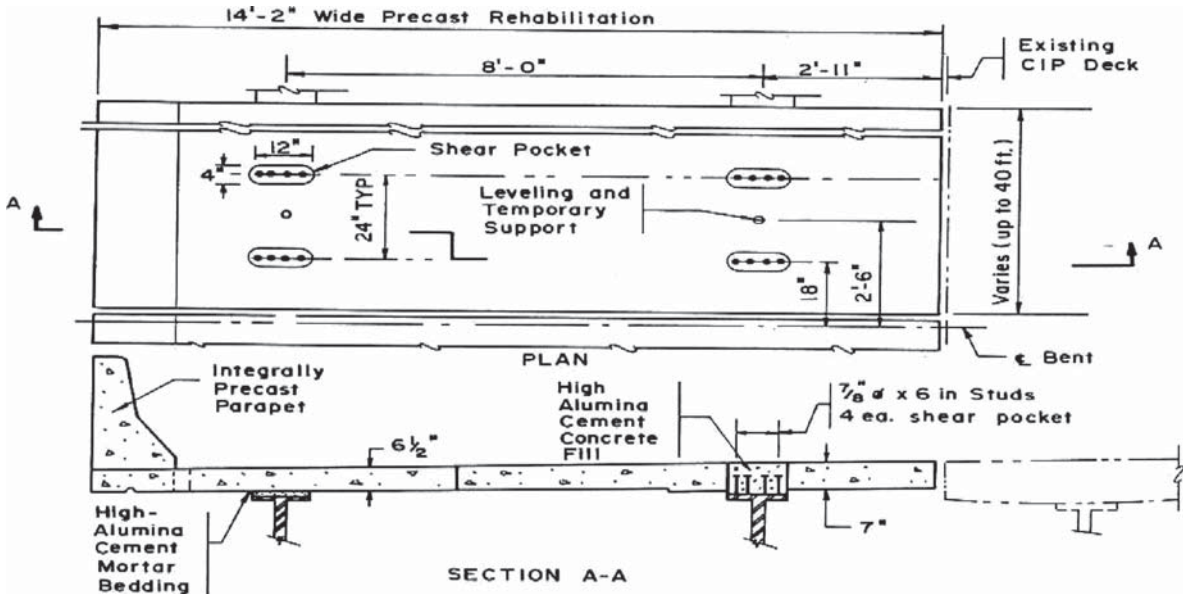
Panel dimensions and cross section of the I-80 overpass project, Oakland, California.
